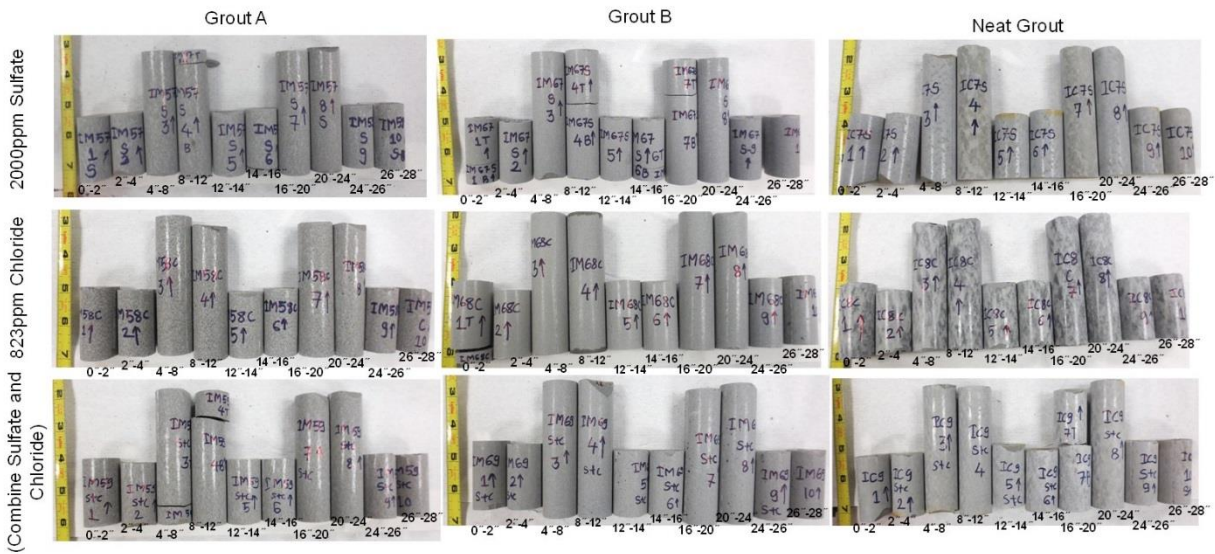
INT Tee-header test specimen after opening, cast with external ion contamination and extra 10% mix water
